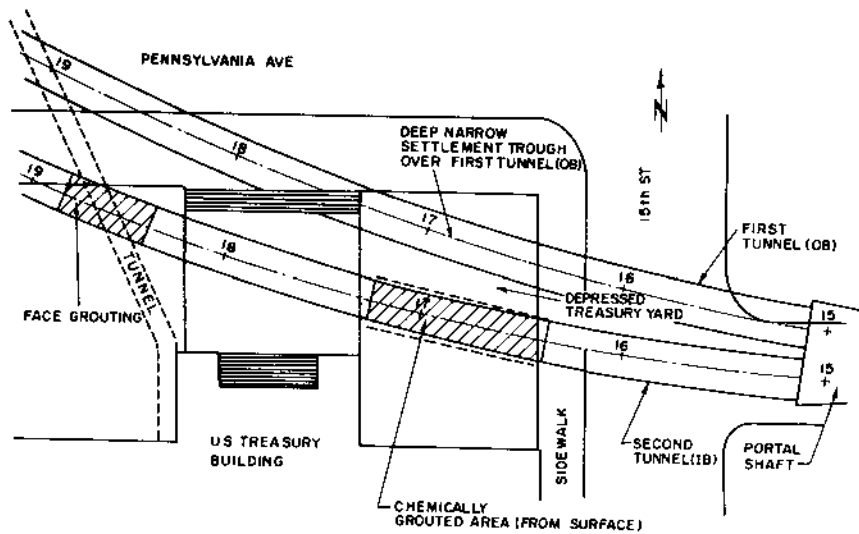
Plan view of tunnel grouting site. (From Ref. 8.)
